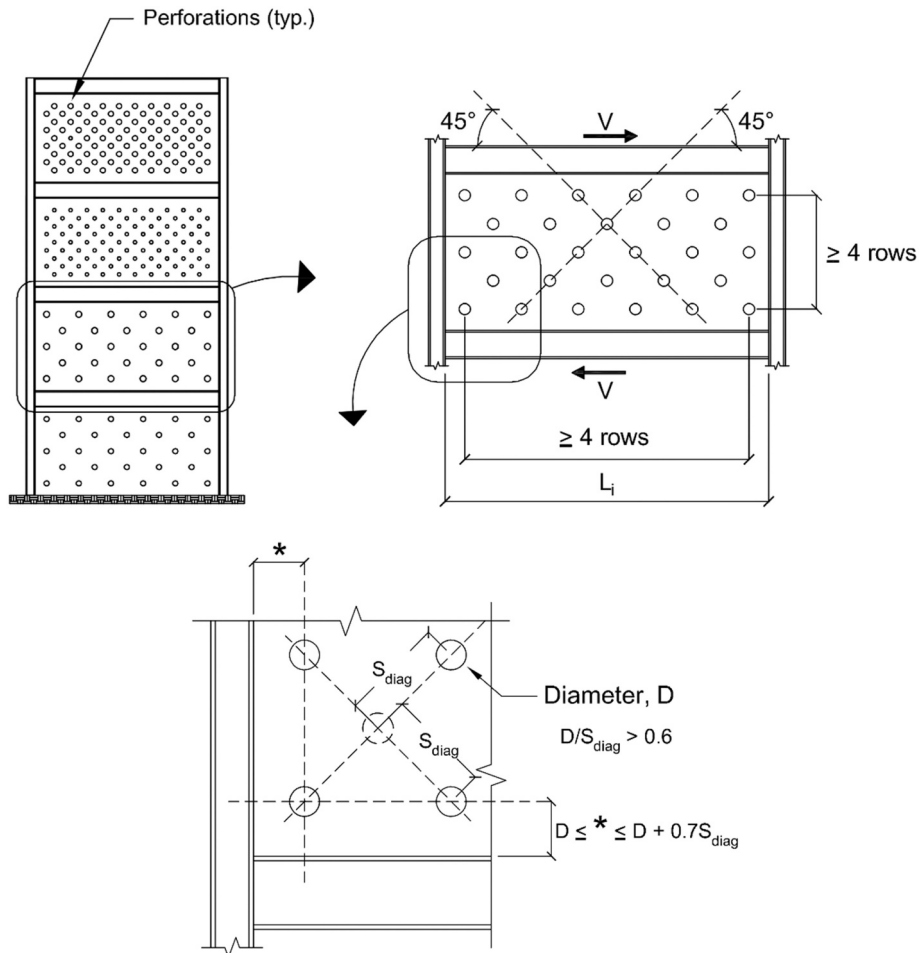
Perforated steel plate shear wall: overall view and detailing requirements.
